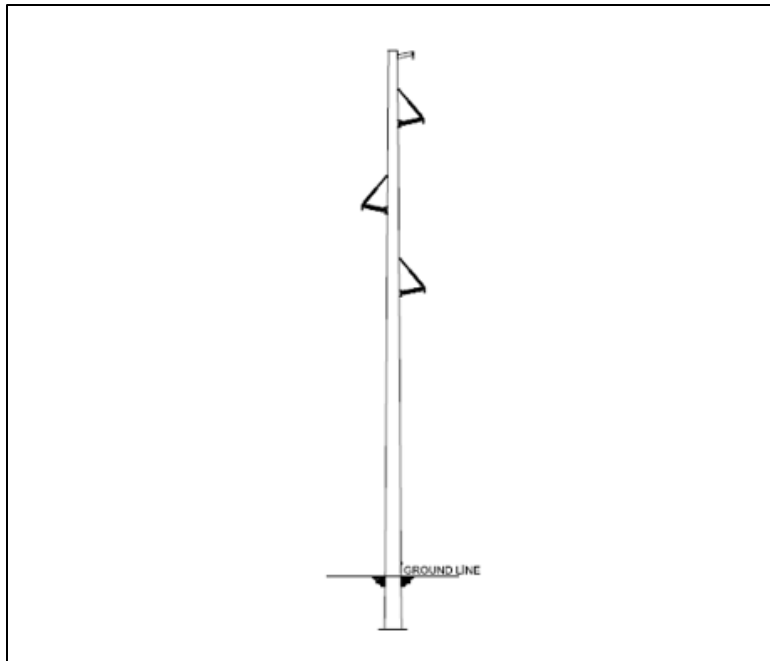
A sample steel pole gen-tie structure. Structures would be approximately 90-100 feet tall with insulators and wire conductor designed to carry 230 kV. See Appendix B for additional structure typical diagrams.
